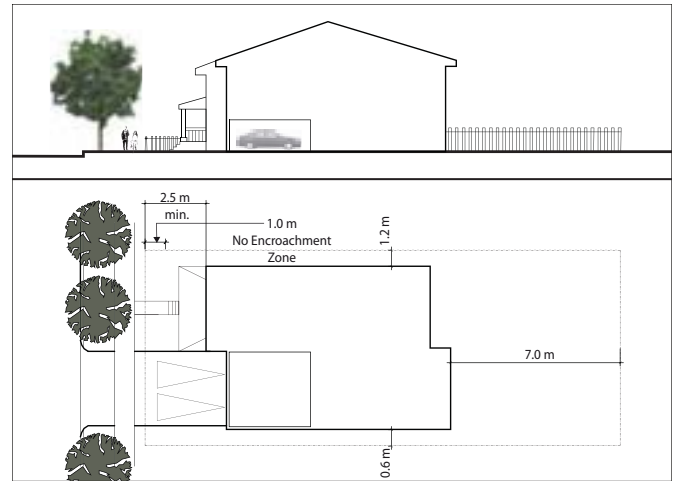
Front yard setbacks for single detached houses should be 2.5 metres minimum.
